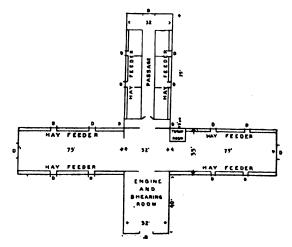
A WISCONSIN SHEEP BARN (FLOOR PLAN).
